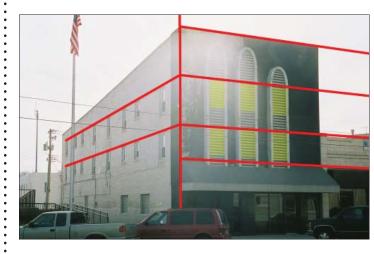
Front Façade Window Locations. The locations of the second and third story windows were derived by projecting the lintel lines of the windows on the north wall around the northwest corner of the building and across the front façade. The presumed locations of the windows behind the louvers are marked with yellow shading in the photograph.
